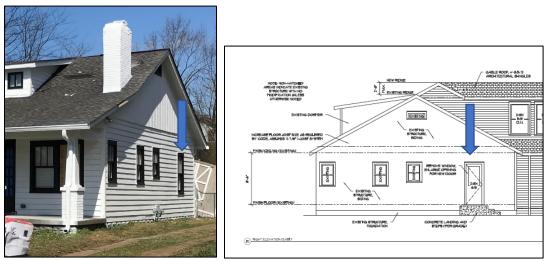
(left) shows the existing window opening and Figure 3 (right) shows the proposed door opening.
